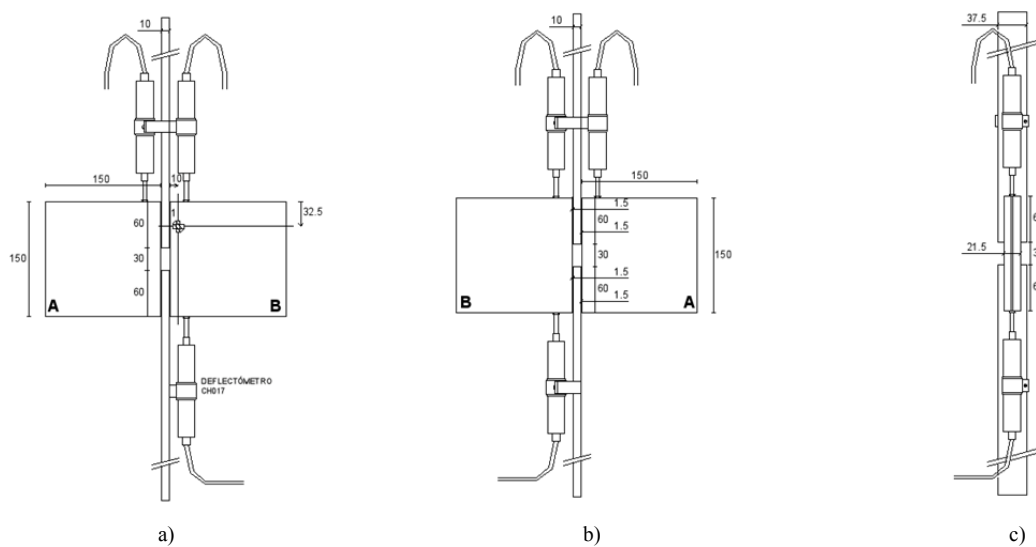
Simple shear test layout. a) Front view, b) back view and c) lateral view. Nominal dimensions in millimeters.
